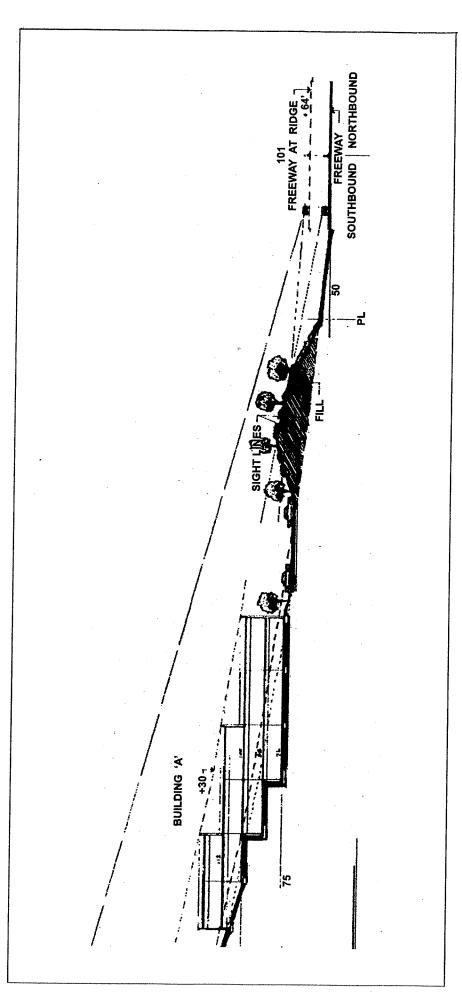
SECTION C -- ASSISTED LIVING RESIDENTIAL USE OPTION Oakview Master Plan
